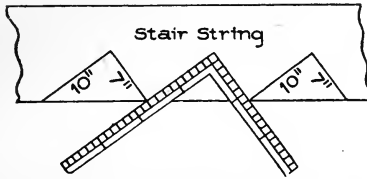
Steel Square Used as a Pitch-Board in Laying Out Stair String.
